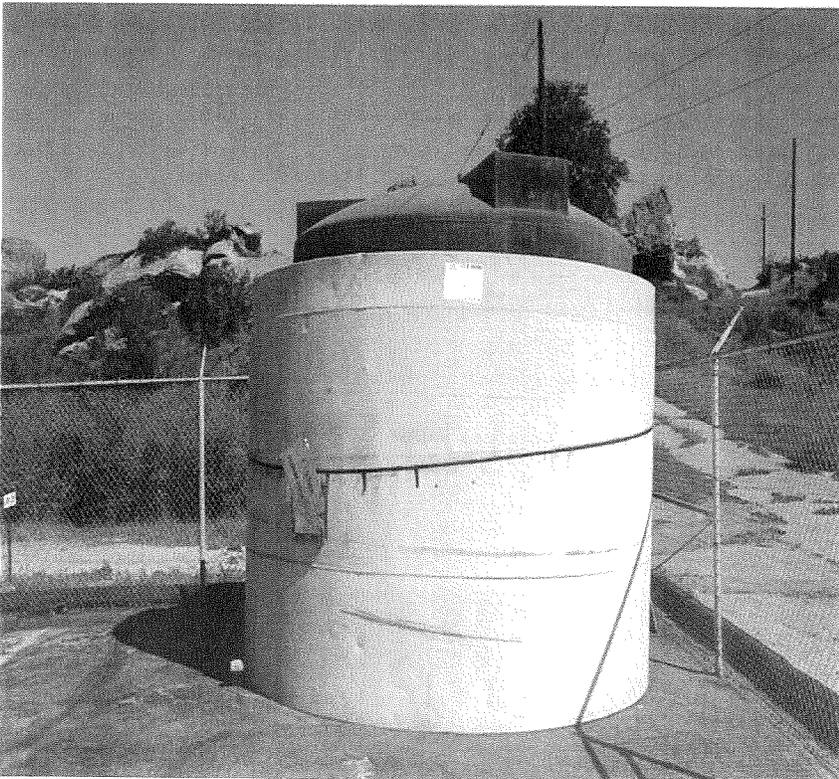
(Above): Secondary containment for pipe from treatment chamber to tank T-1 (looking south).
